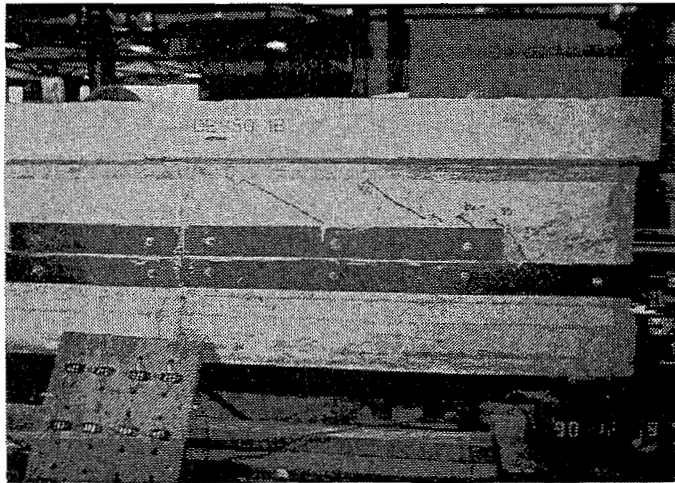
Initial Web Shear Cracking, Crack Propagation Delayed by Steel Cladding, DB850-1B
